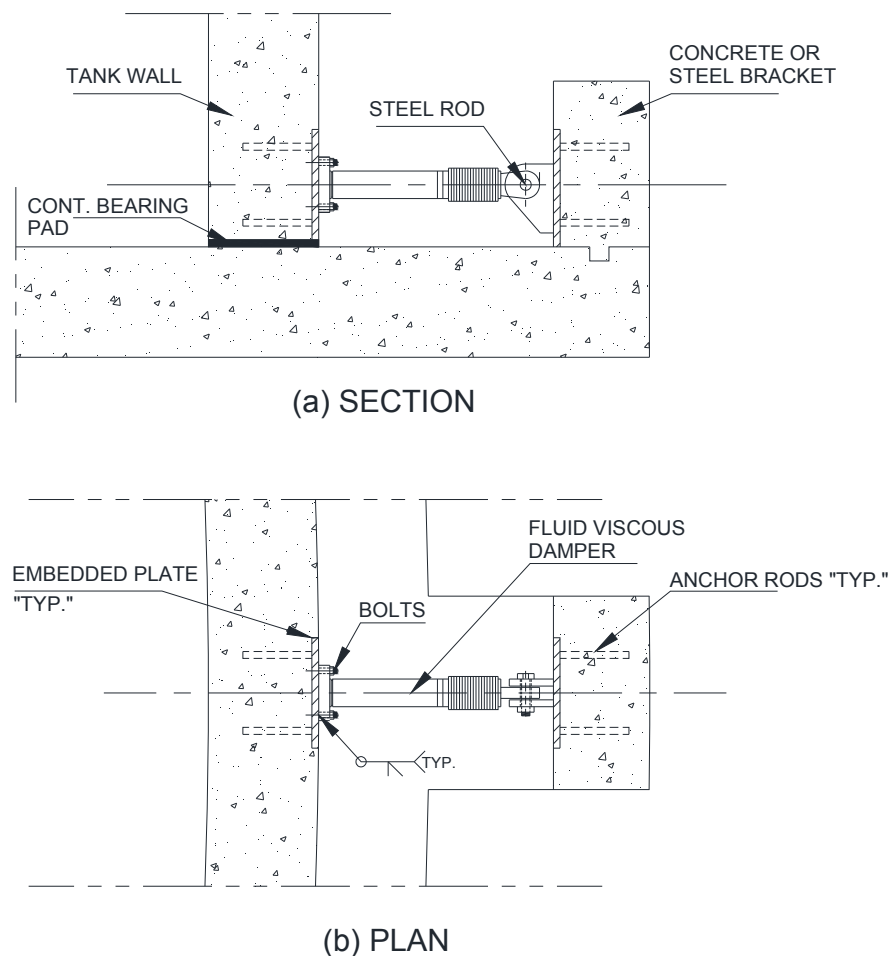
Fluid viscous damper connection detail; (a) Section, (b) Plan
